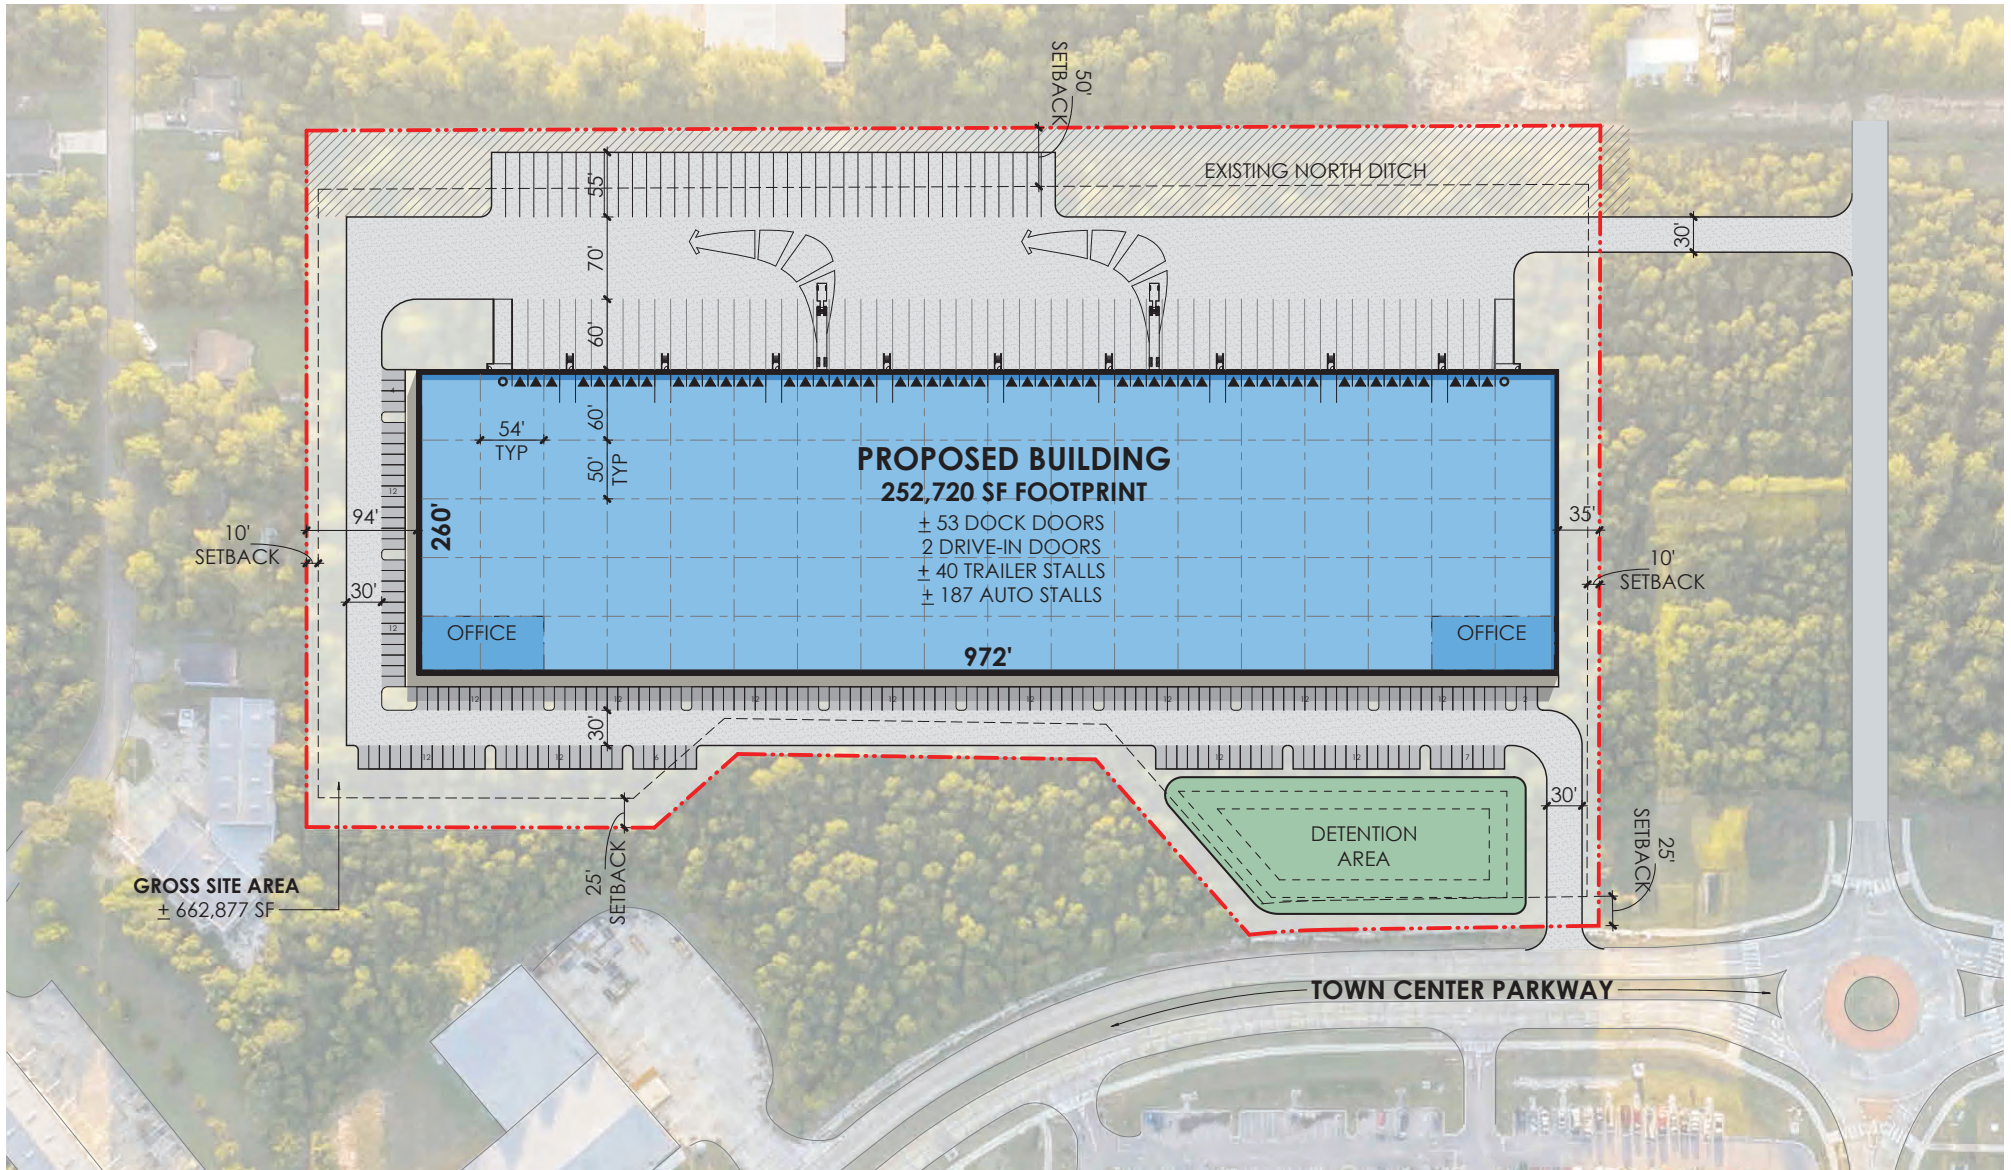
Site Plan, Architectural Renderings, and Landscape Plan
